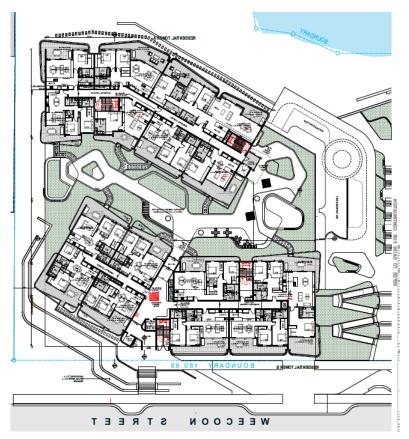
PROPOSED THIRD FLOOR PLAN:
